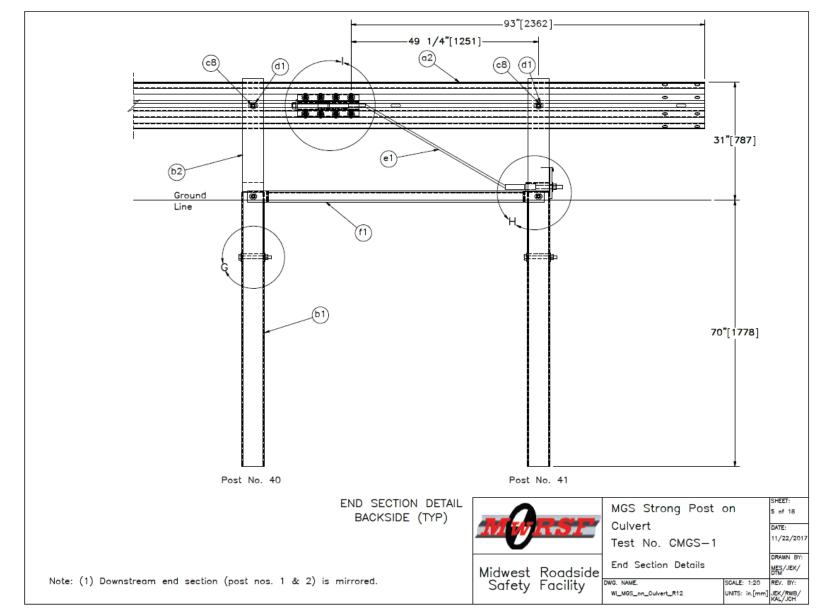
End Section Details, Test Nos. CMGS-1 and CMGS-2
